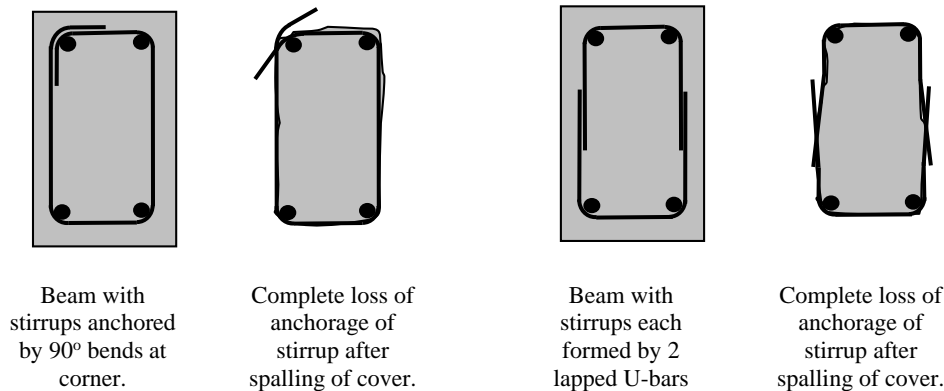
(a) – Loss of Anchorage of Stirrups formed by 90° Bend End
